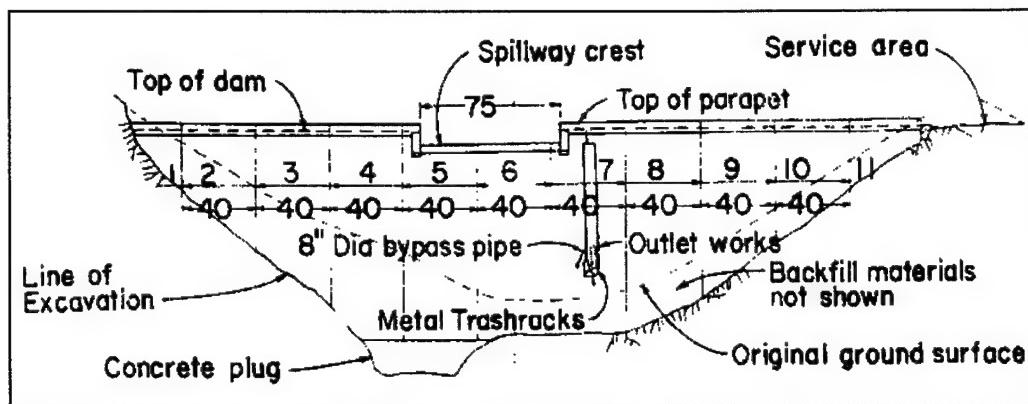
Upstream elevation of Wildhorse Dam. Note dental concrete (concrete plug) (USBR)
